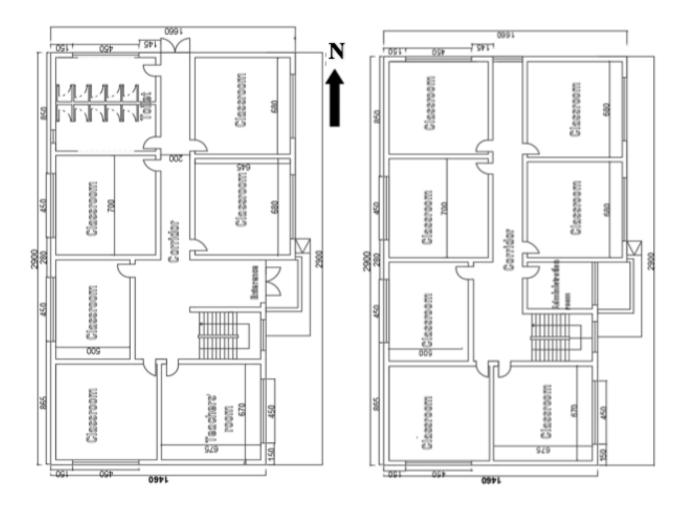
Ground (left) and 1st & 2nd (right) floor plans (Redrawn by author, based on plans from the archive of the school).
